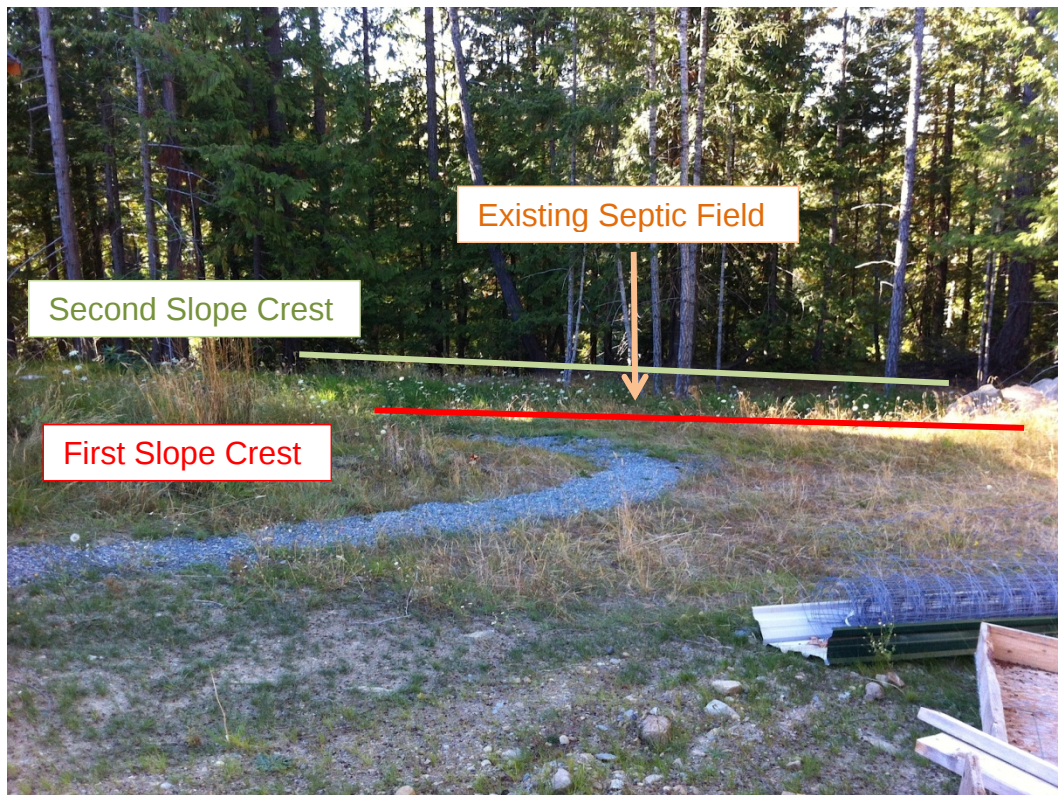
View to the Northwest from Proposed Location of Accessory Structure
